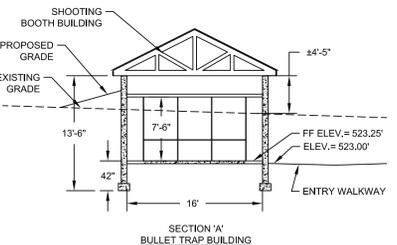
DETAILED CROSS-SECTION 'A' AT SHOOTING BOOTH BUILDING
